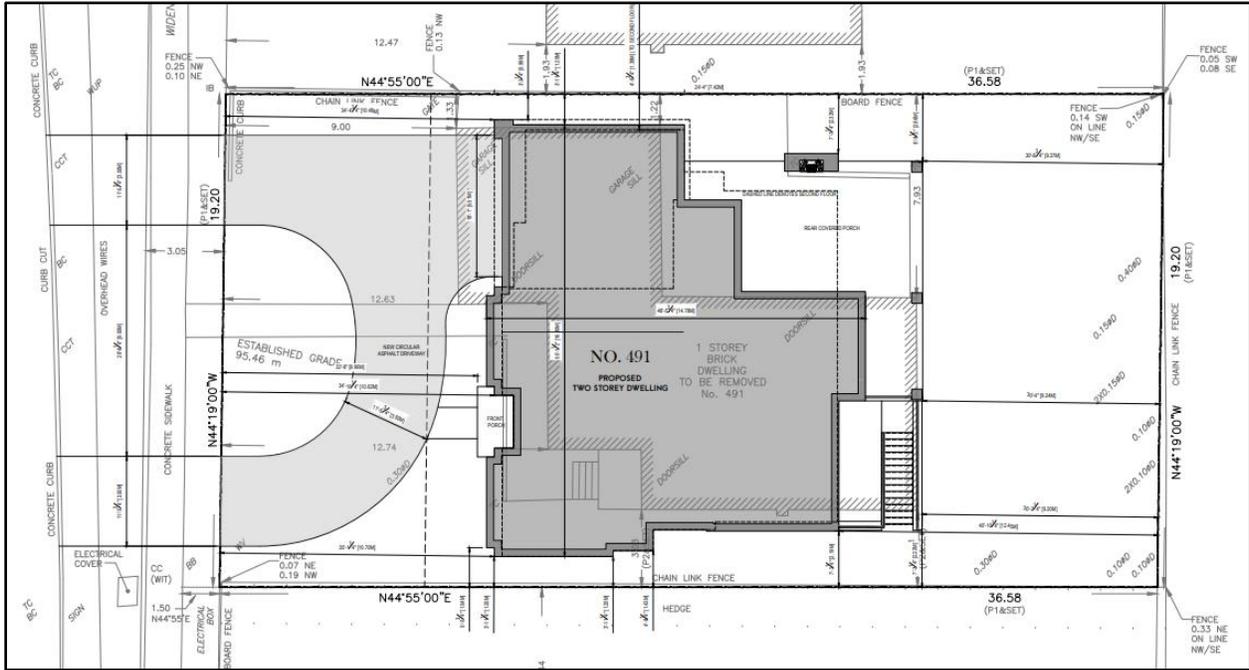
491 Fourth Line Site Plan (1<sup>st</sup> Submission)
